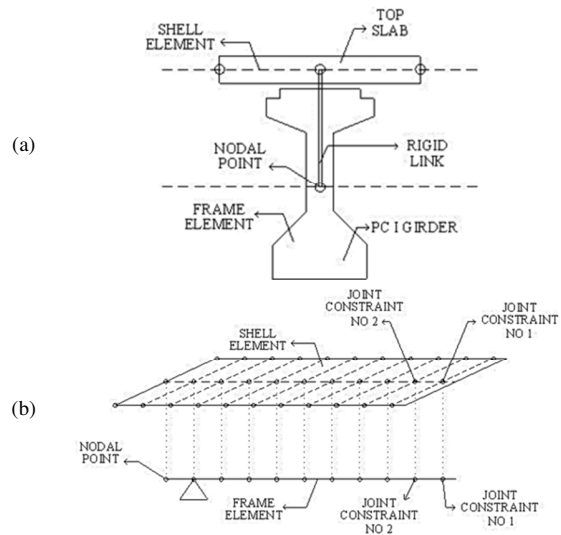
Link slab modelling approach: (a) cross section, (b) longitudinal section.
